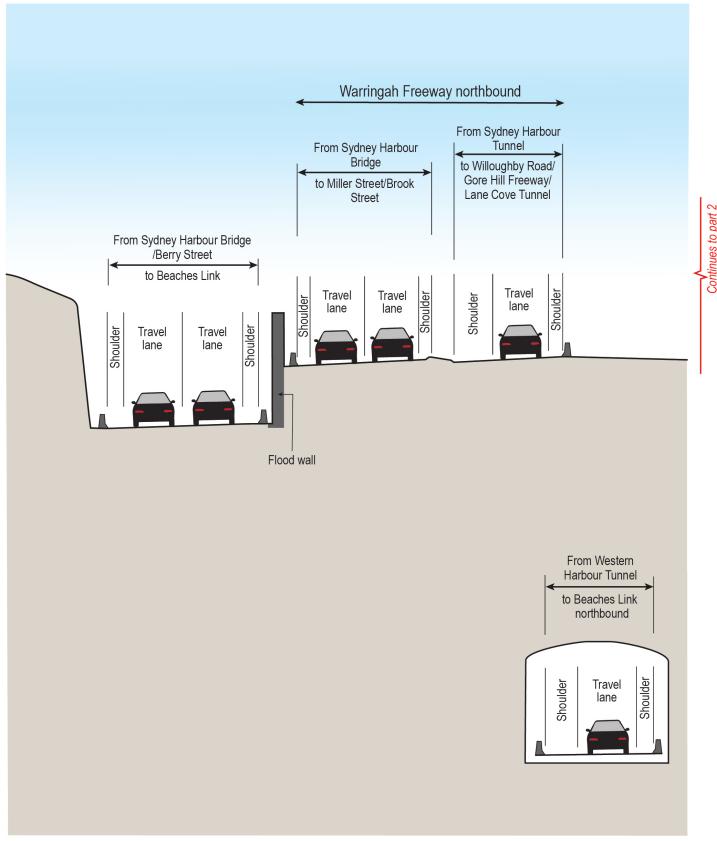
Indicative cross-section through the connection between the Beaches Link and Gore Hill Freeway Connection project and the Warringah Freeway Upgrade (part 1)
